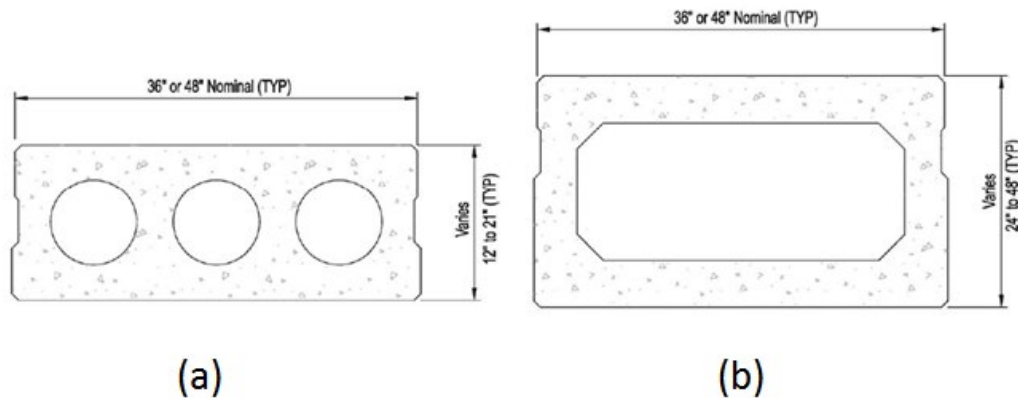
(a) Single precast prestressed deck slab beam (FHWA, 2013a) (b) single precast prestressed box beam (FHWA, 2013a)
